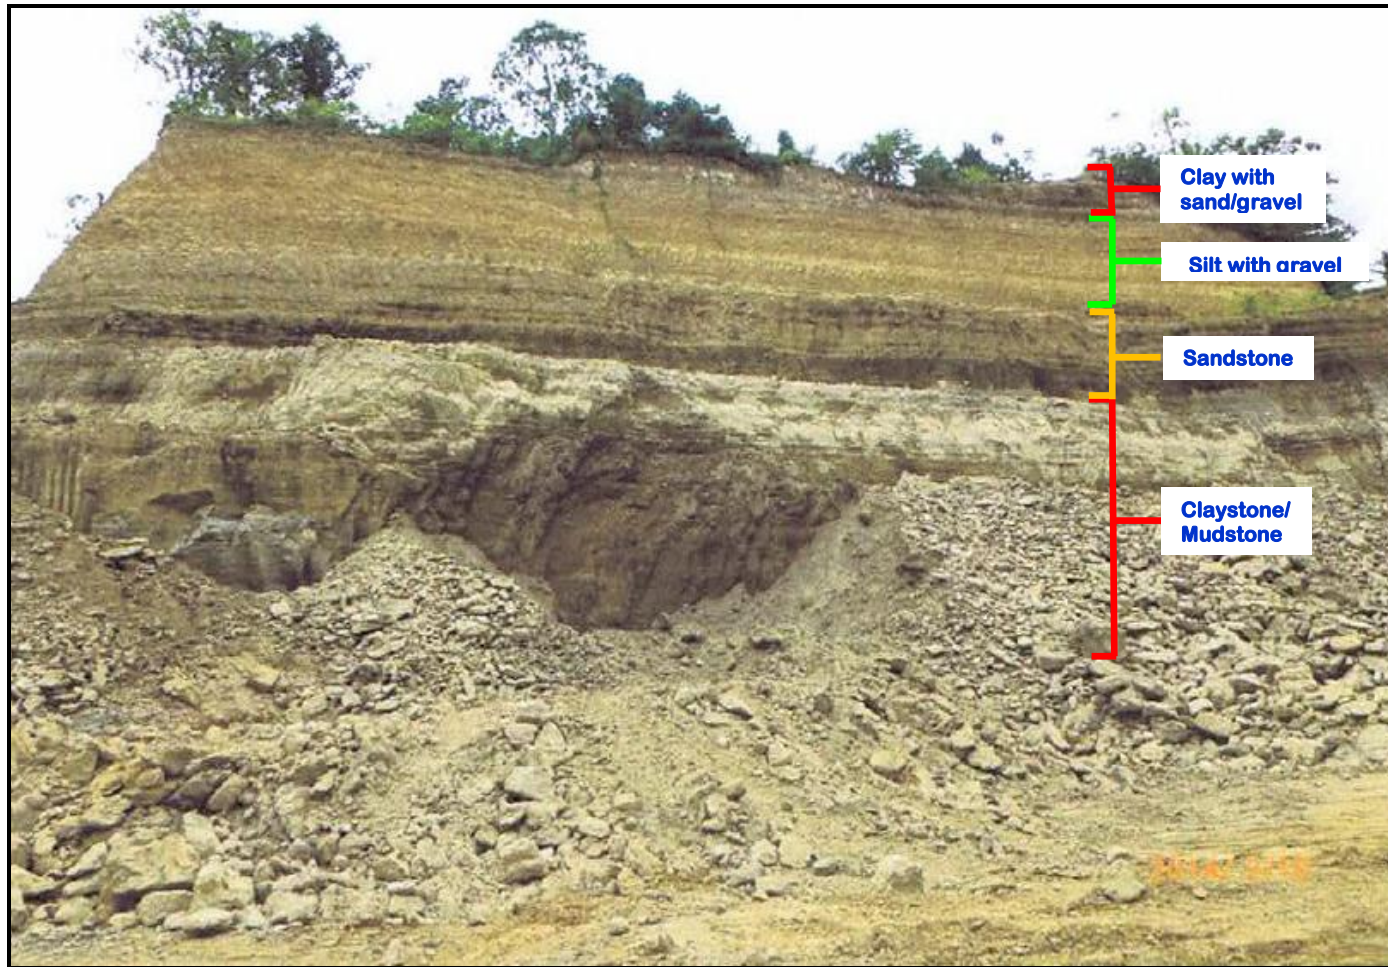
Excavated condition at a quarry site about 1 km from the tunnel section.
